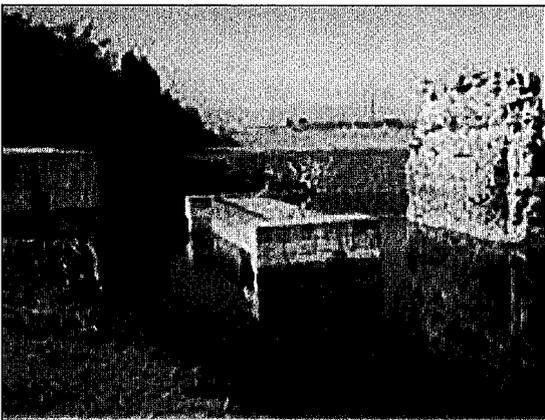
Abutment on the Romanian side of river showing remains of the end of the main bridge (on right) and foundation for the flanking masonry arches.
